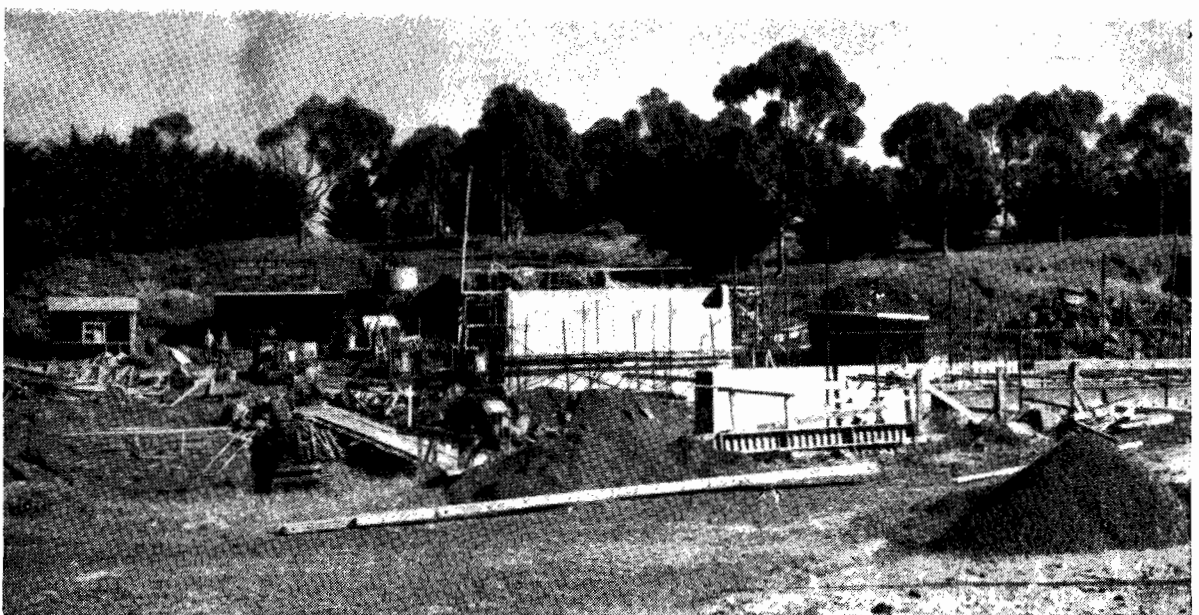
Progress of new bridge on Princes Highway West, over Kororoit Creek
